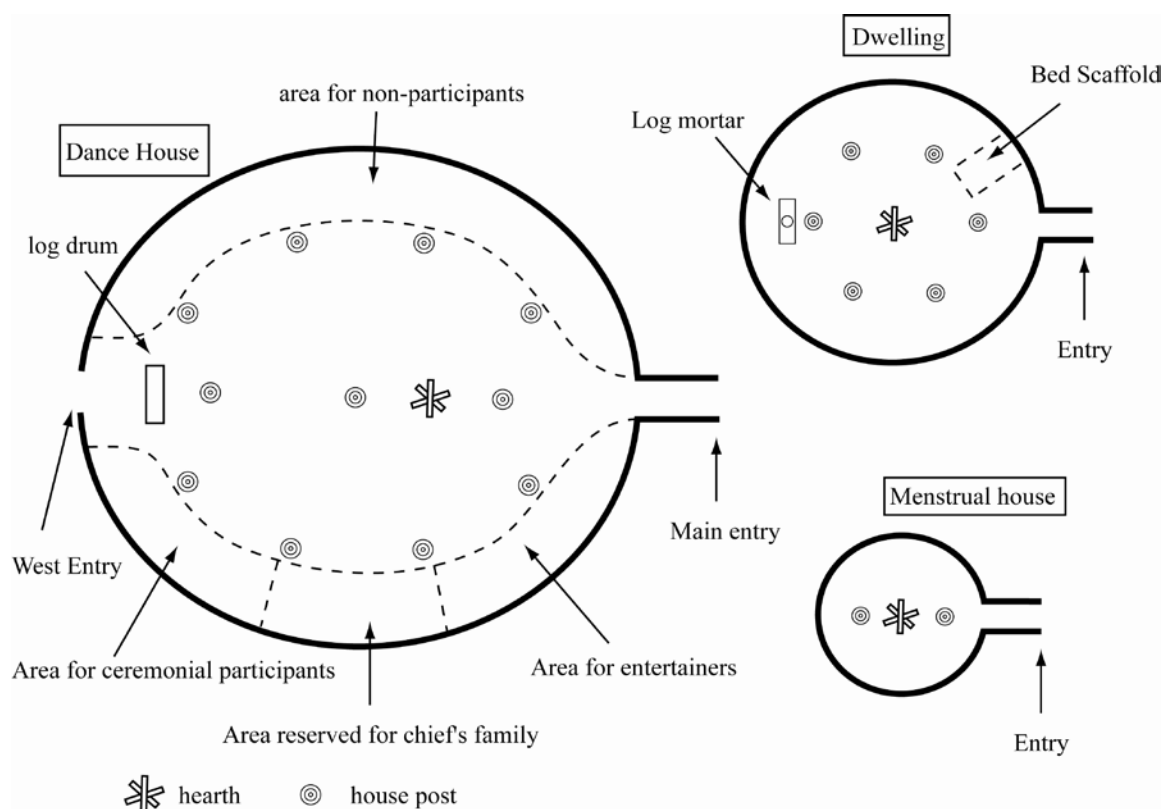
Ground plans of Hill Patwin buildings (adapted from McKern 1923:170)
